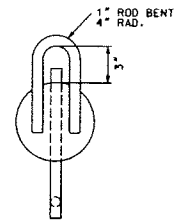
DETAIL G - SUSPENSION INSULATOR VANG AT END OF DAVIT ARMS
